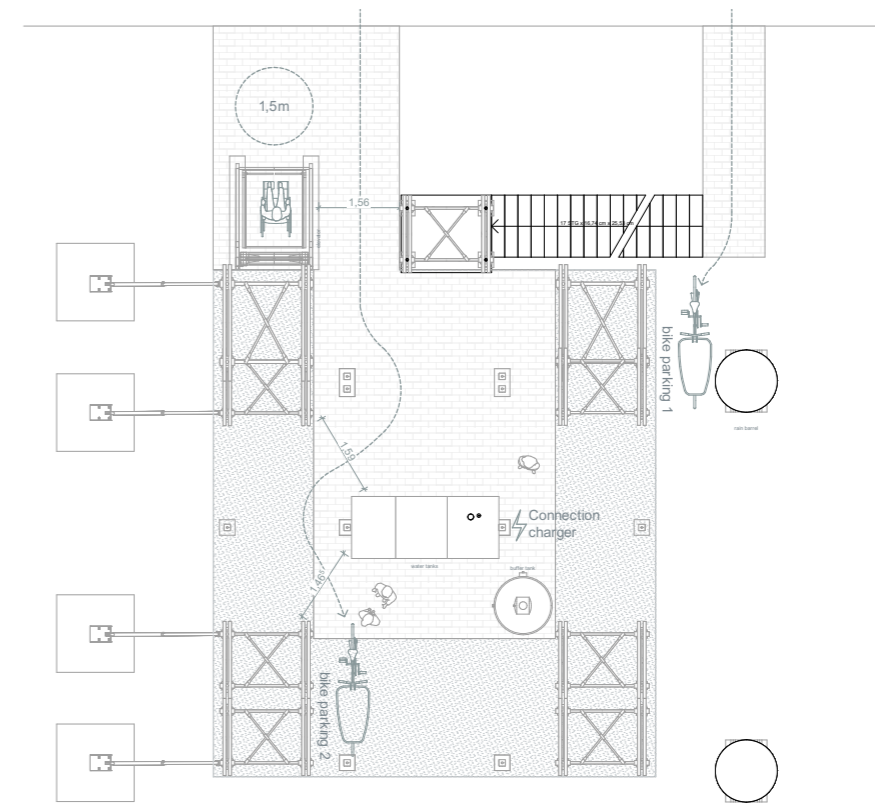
16. Floor plan HDU with parking space and passenger ways
